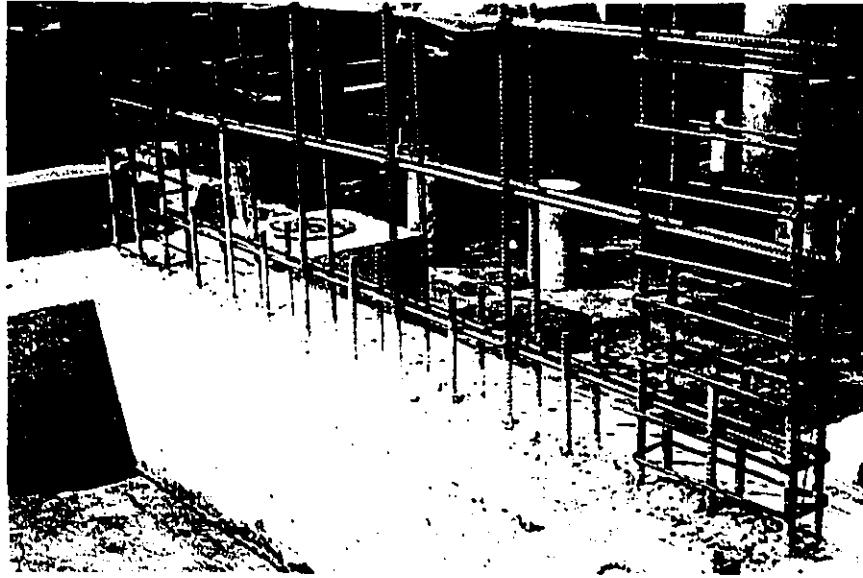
Picture of reinforcement layout of Wall 6 with base cast.
